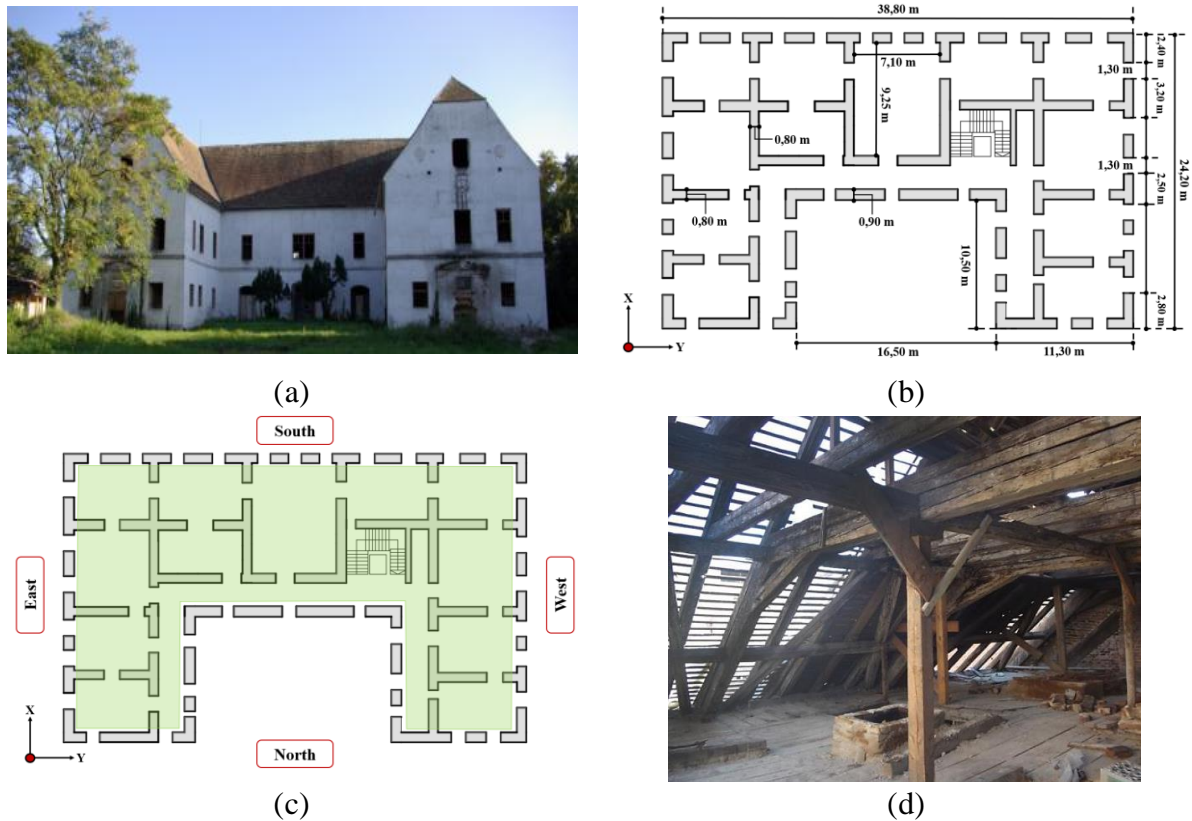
Castle of Banloc: (a) external view, (b) architectural plan layout, (c) geographical orientation and (d) timber roof structure.
